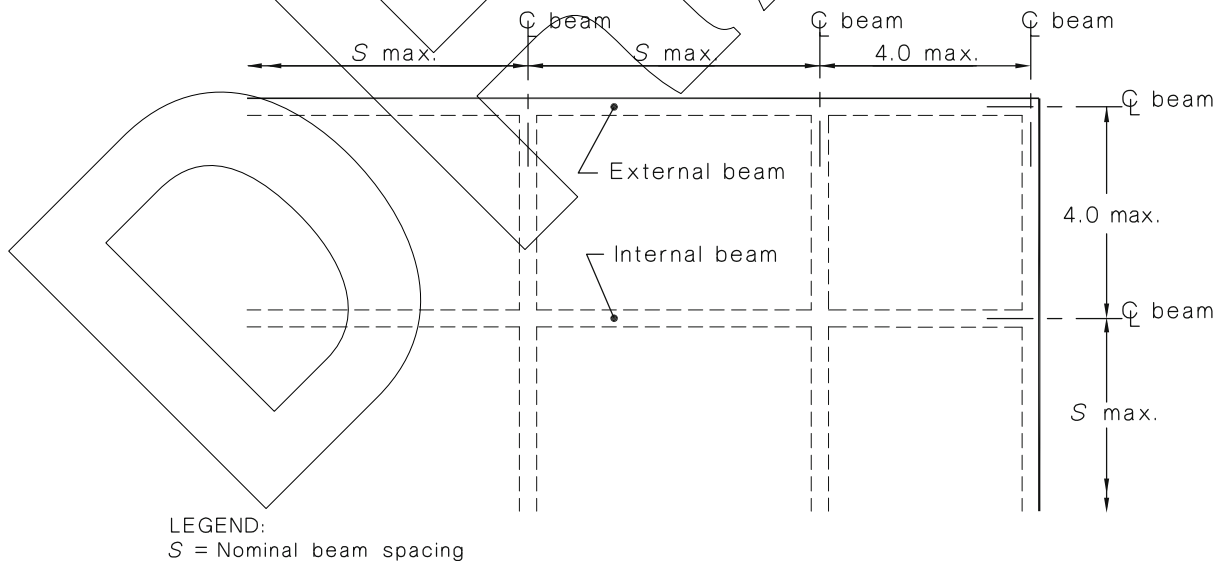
LAYOUT OF FOOTING BEAMS
